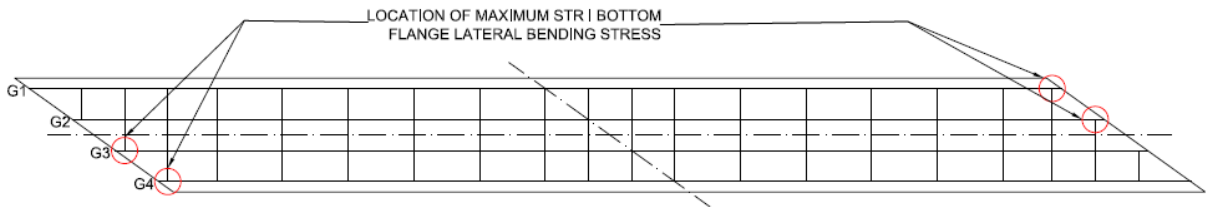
Maximum STR I bottom flange f_ℓ in girders of Bridge 25.
